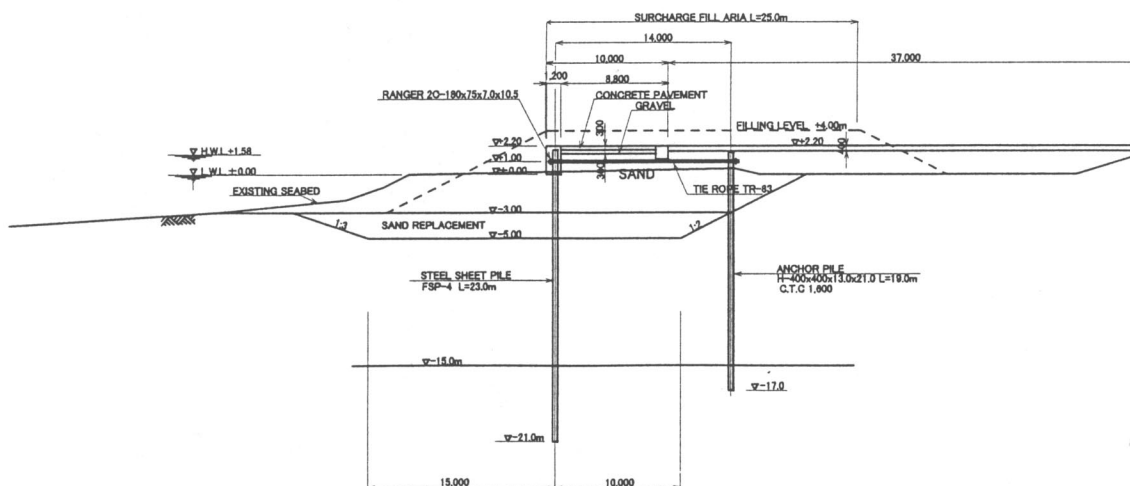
Anchored steel pipe pile type with replacement of foundation at the front
